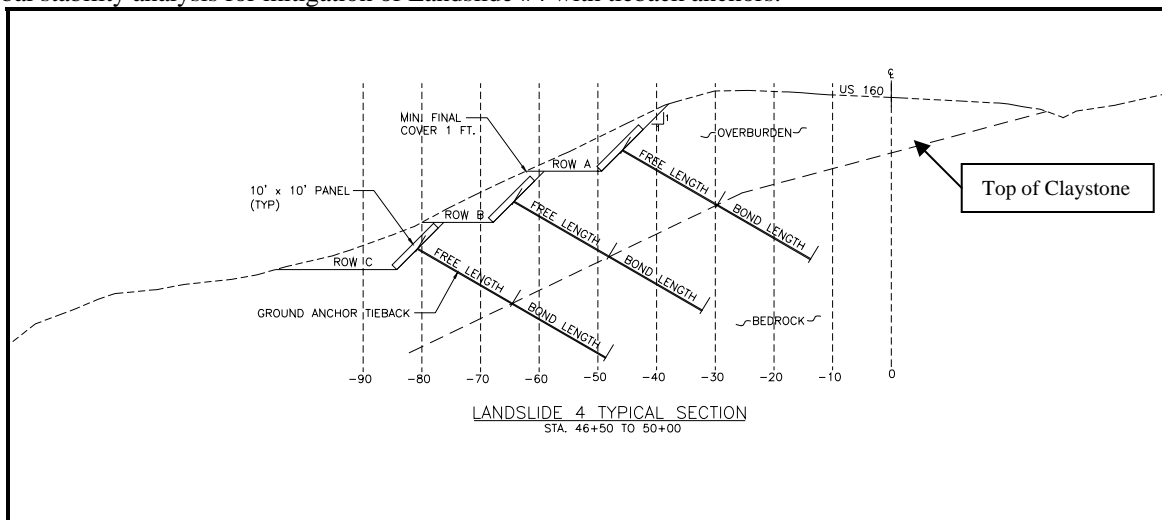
Typical Cross Section of Ground Anchor Tieback System.
